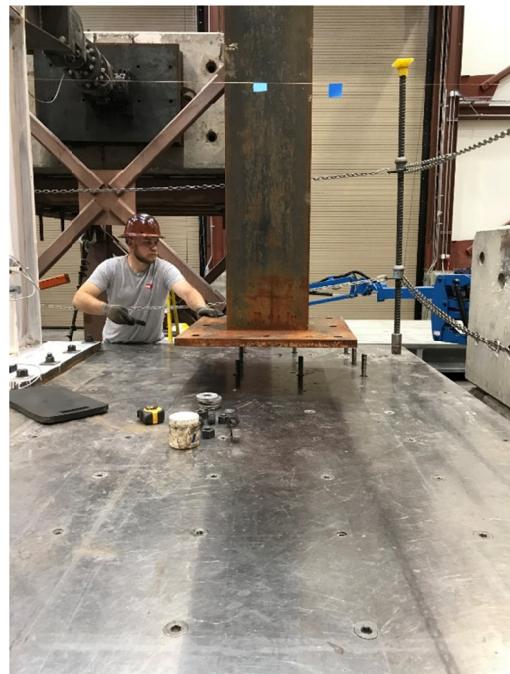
Out-of-plane restraining column positioning on the shake table.
